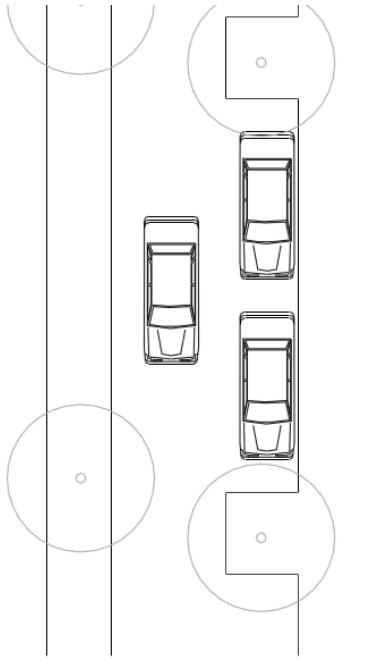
XX Goddard Street – Section D (plan view-indicative)
